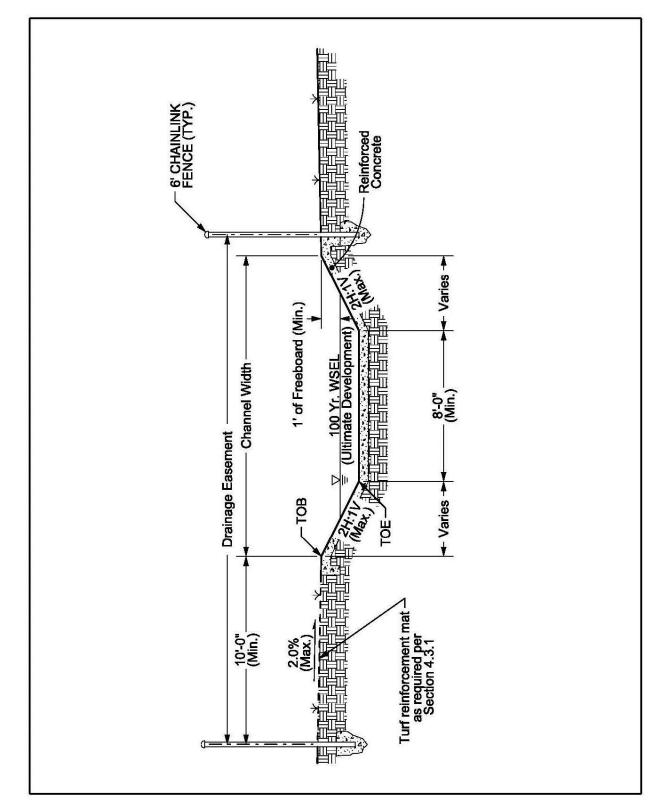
Typical3.11 Plan –<u>View -</u> Trapezoidal Concrete -Lined Channel
